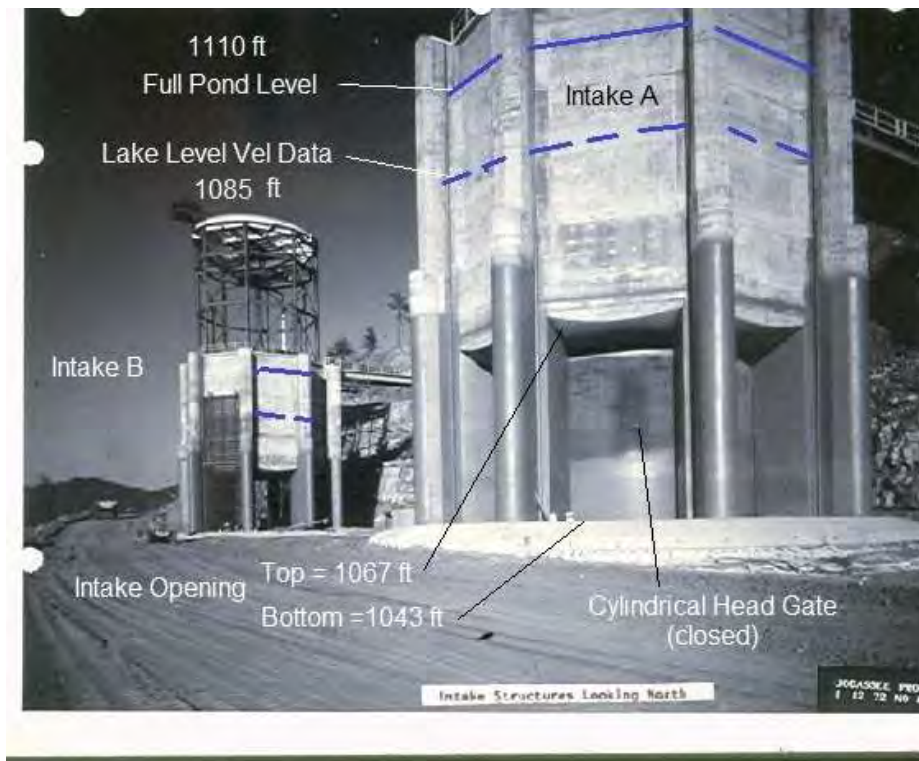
Construction photograph of JPSS forebay intake structures, with elevations.
